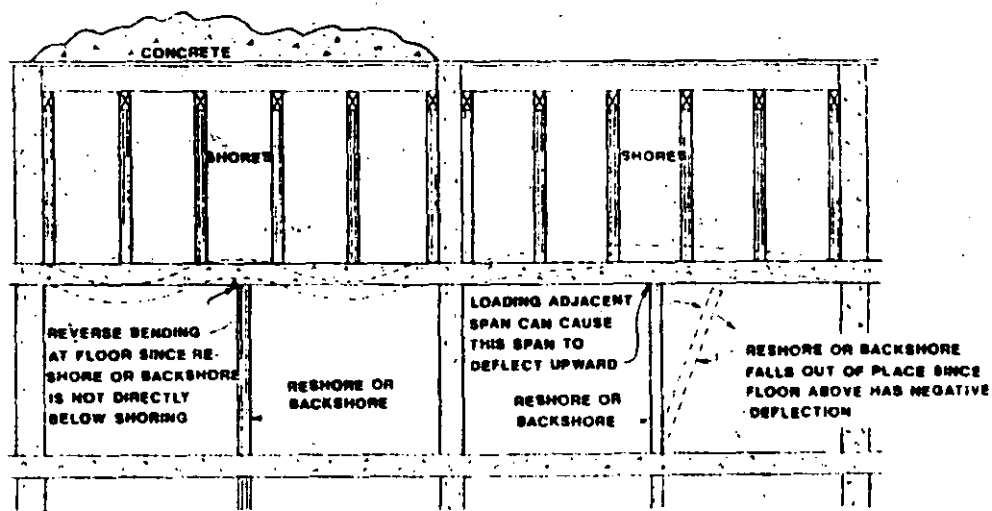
a—Reshore installation. Improper positioning of shores from floor to floor may create bending stresses for which the slab was not designed. If reshores or backshores do not match the shores above, then calculate for reversal stresses. Generally, the dead load stresses are sufficient to compensate for reversal stresses caused by shores. Reshores and backshores must be prevented from falling.
